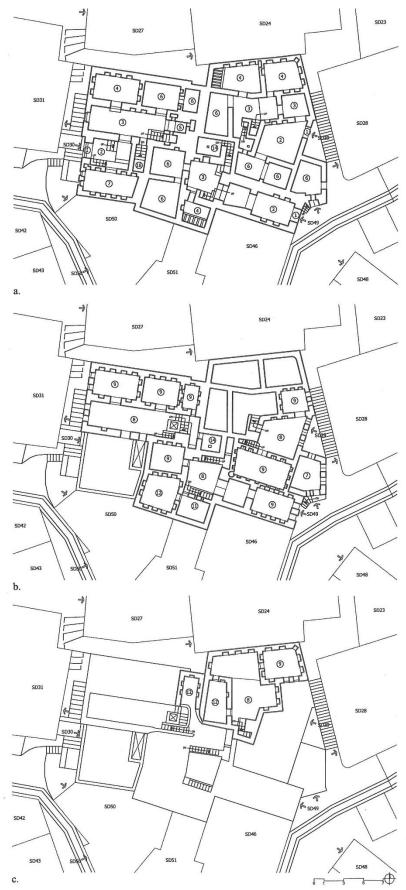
Floor plans of dwelling cluster SD29, SD30 & SD49; *a*. Ground floor; *b*. First floor; *d*. Roof and second floor; 1. main entrance door; 2. First *dahreez*; 3. Second *dahreez*; 4. *suffah*; 5. *caqid*; 6. *darss*; 7. Sablah; 8. *carshah*; 9.*gurafah*; 11. Kitchen store ; 12. Kitchen; 14. Latrine; 16. Light shaft.
